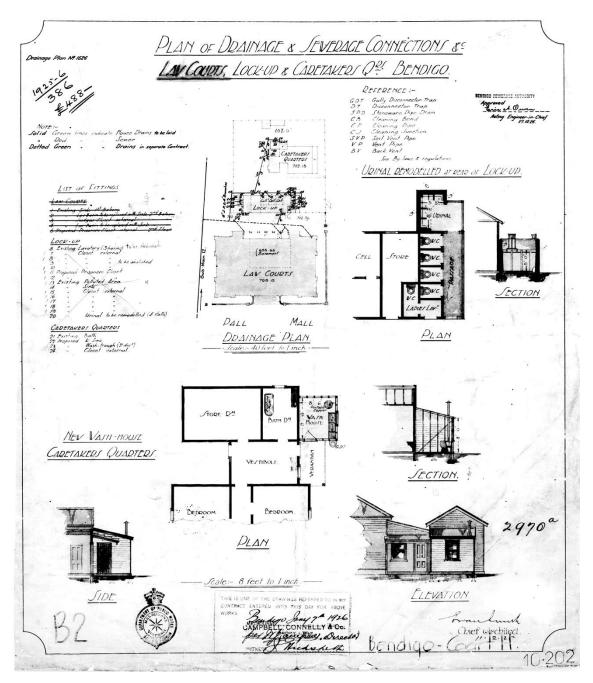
Plan of Drainage & Sewerage Connections Law Court, Lock up & Caretakers Qtrs. Bendigo Source Public Works Department, PROV LCB 10.202
